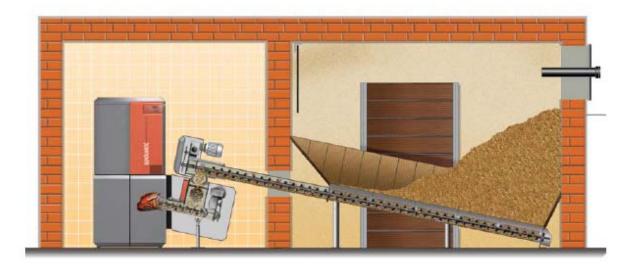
Pellet boiler with a screw Source: http://www.guntamatic.com/pdf/guntamatic-pellets5-06.pdf
